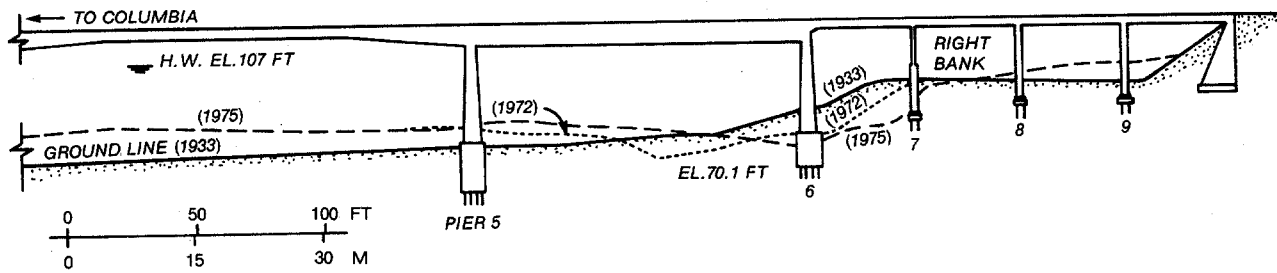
Bridge elevation sketch showing recession of right bank, 1933-75.
